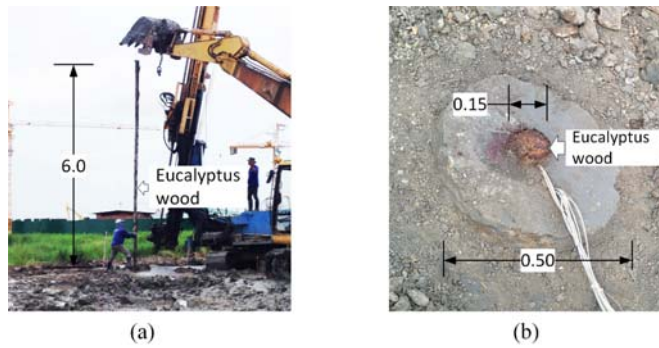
(a) Stiffened core installation and (b) Photo of SDCM pile before testing
